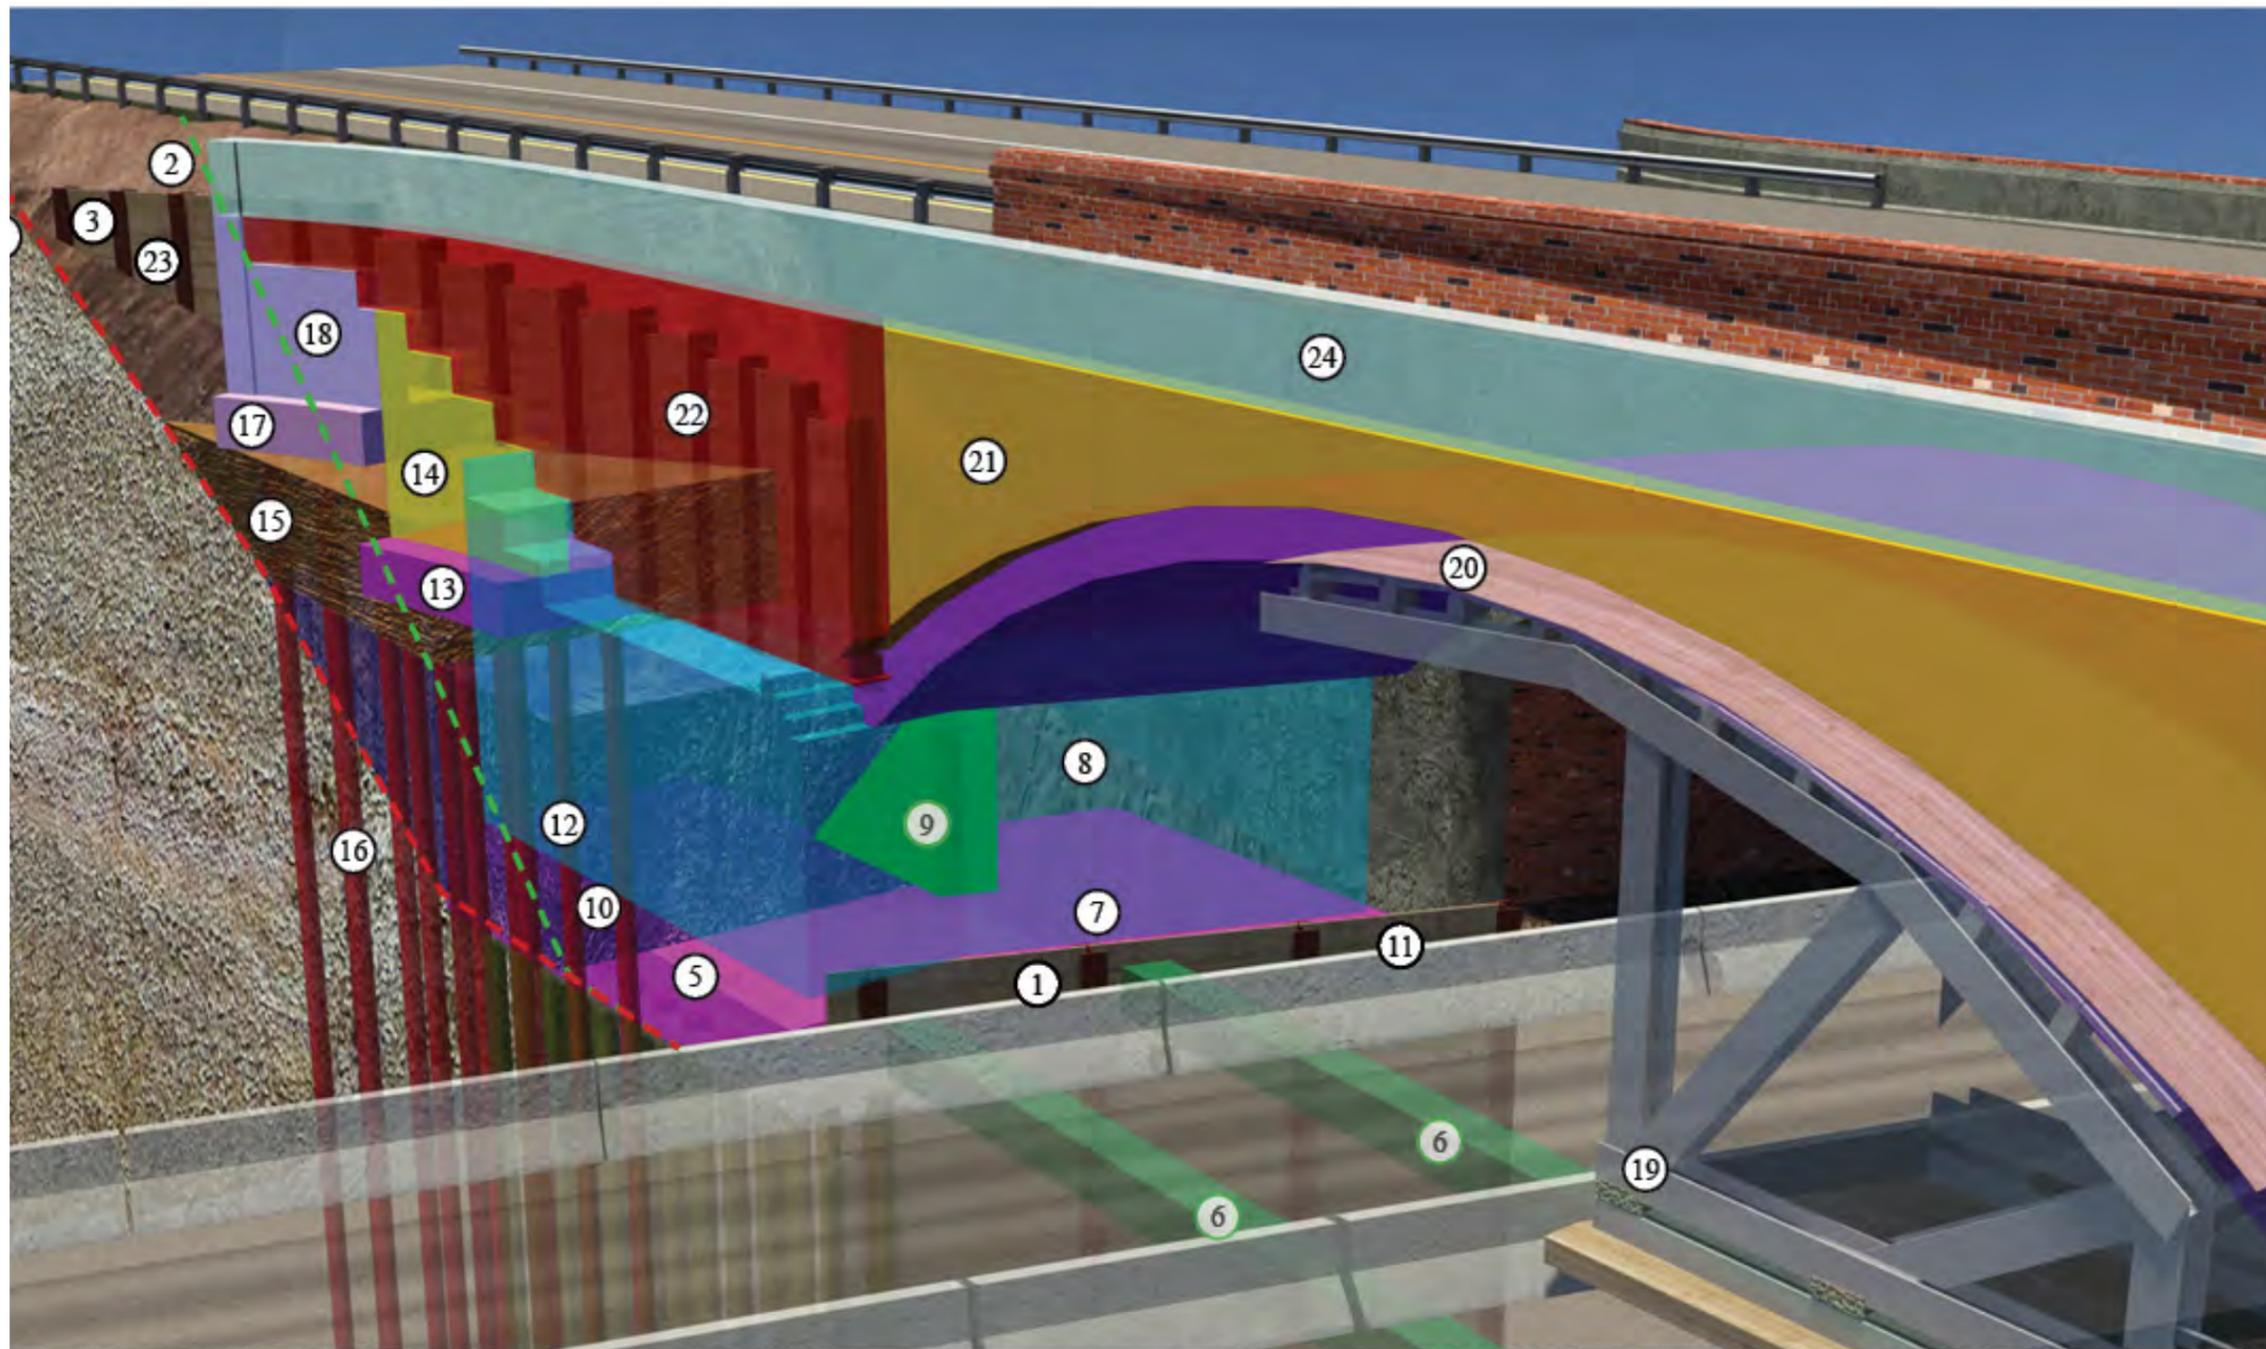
Stay in place decking, edge forms, splicing stainless steel rebar, pour decks, install ITS, remove trestle, excavate/ final grade wider median for wetland opportunity.
